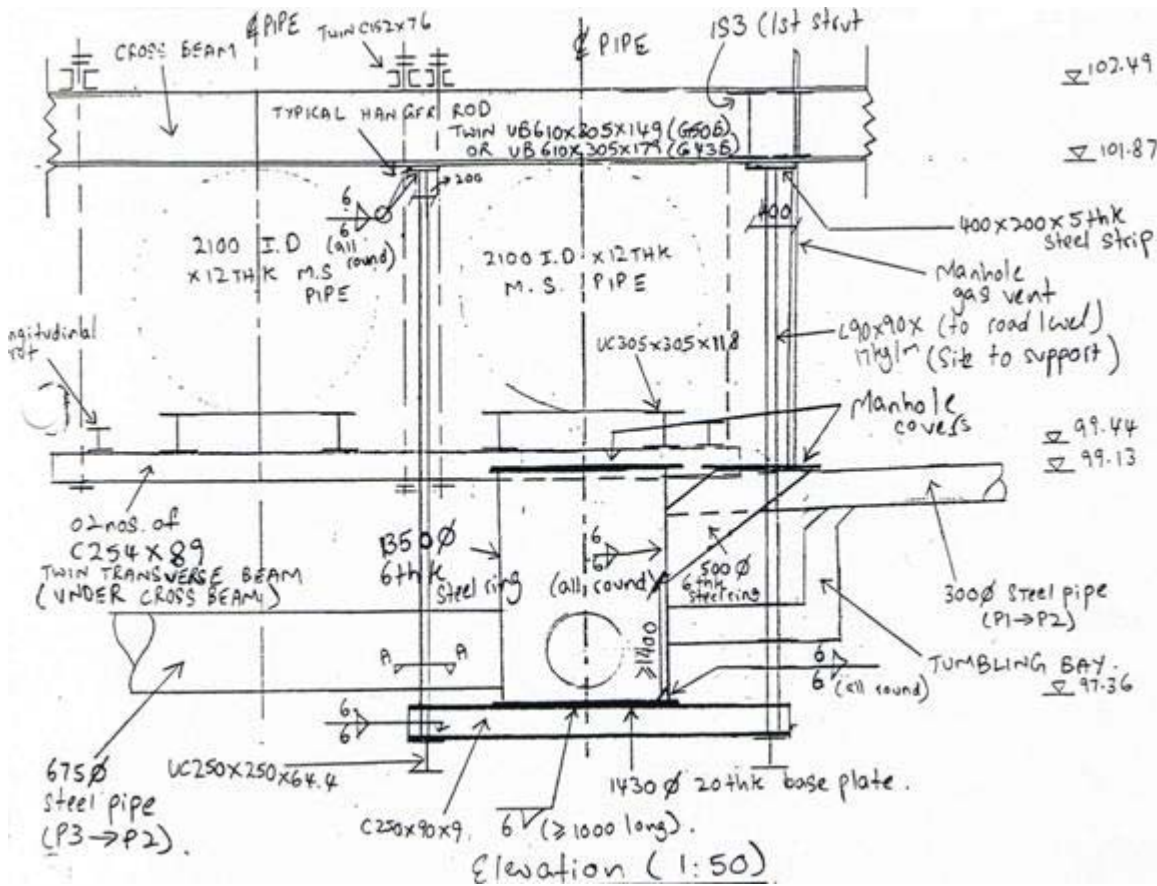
Manhole supported by same strut as water pipe (Figure 17) and cross beam (Figure 16).
